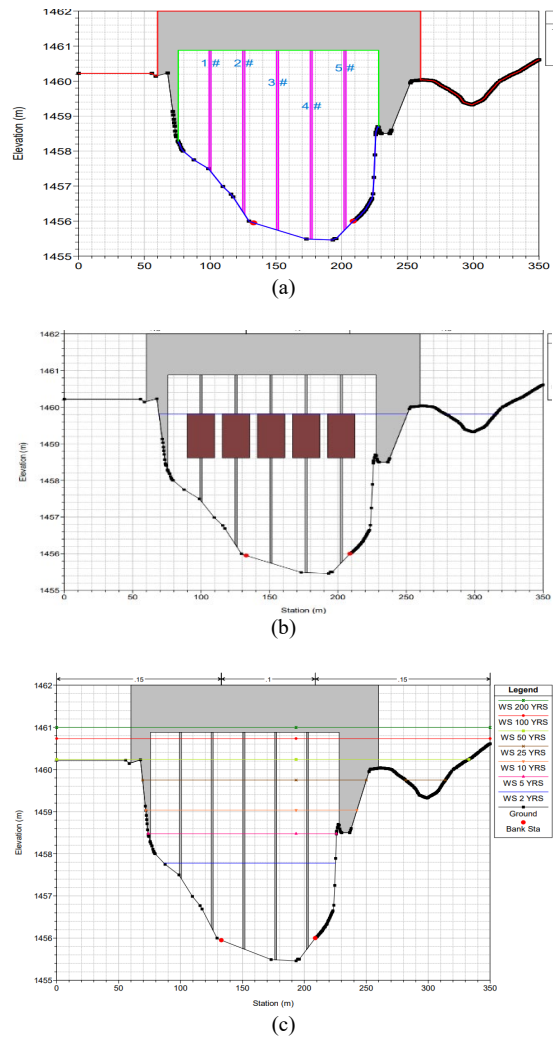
Geometry of bridge: a) Cross section of bridge, b) Accumulation of debris in the cross section of the bridge and c) Water level's for different floods
